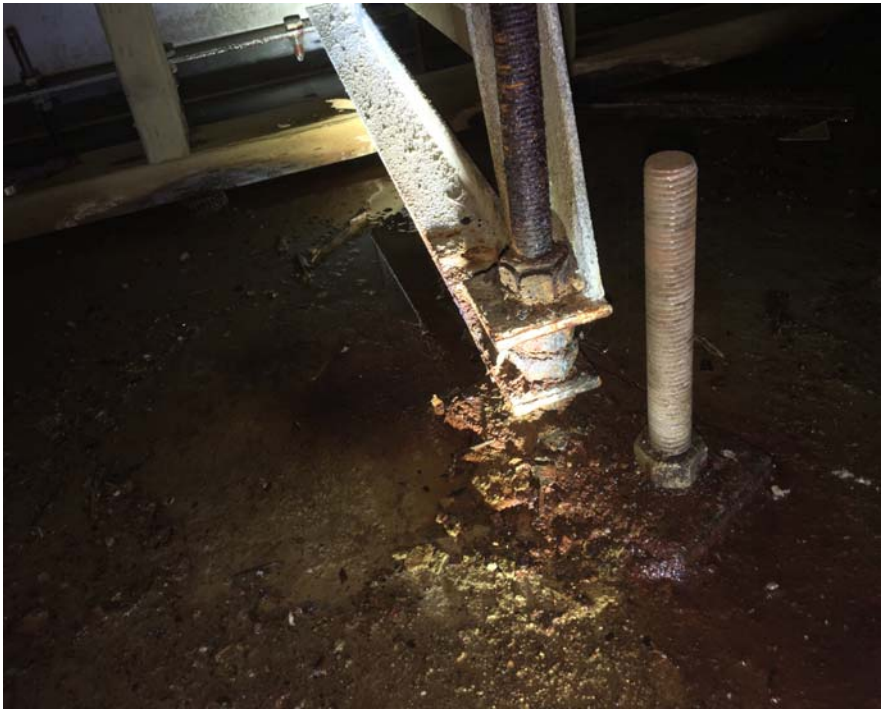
Photos showing *bearing wall deterioration of wooden sill plates including log screws corrosion* in all areas under water ponding and constant moisture.
